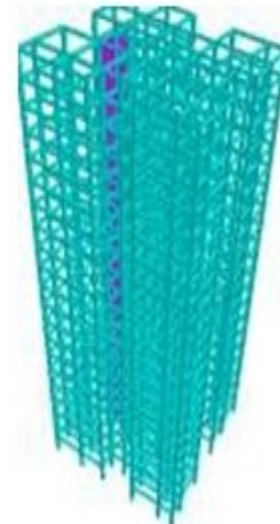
G+20 RCC Shear Wall Structure with different shear wall location
